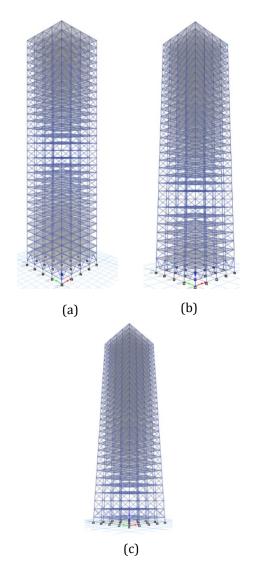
Retrofit using a) Inverted V bracing b) V bracing c) X bracing of 30 storey building
